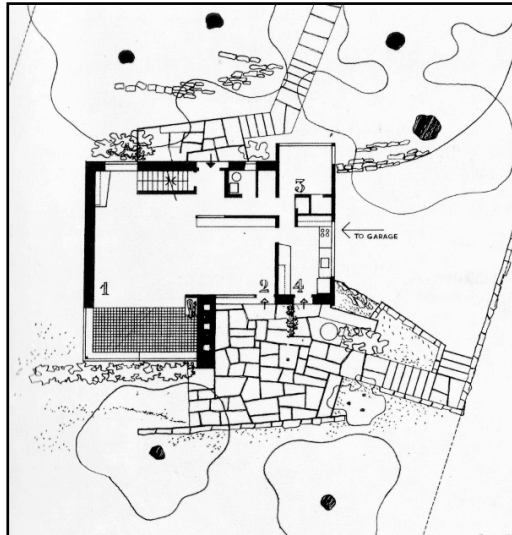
Louis Kahn Ground floor plan, Oser House, Elkin Park, Pennsylvania, 1940. (Rose, 2006, p.19)
